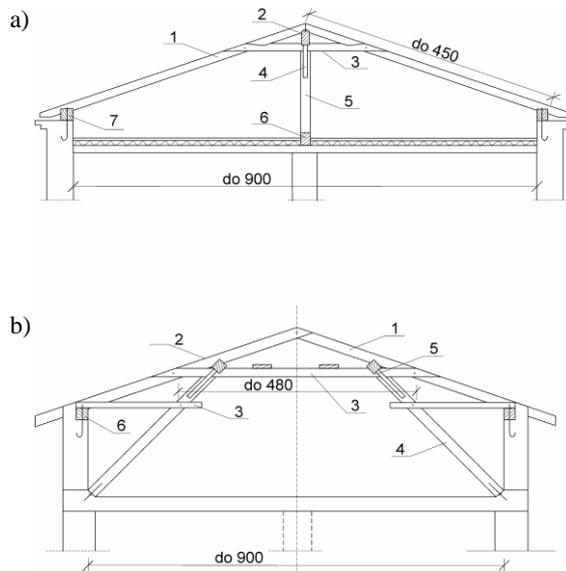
a) Purlin-tie roof with comb board: 1 - rafter, 2 - comb board, 3 - collar tie (roof tie), 4 - angle brace, 5 - post, 6 - ground sill, 7 - plate
